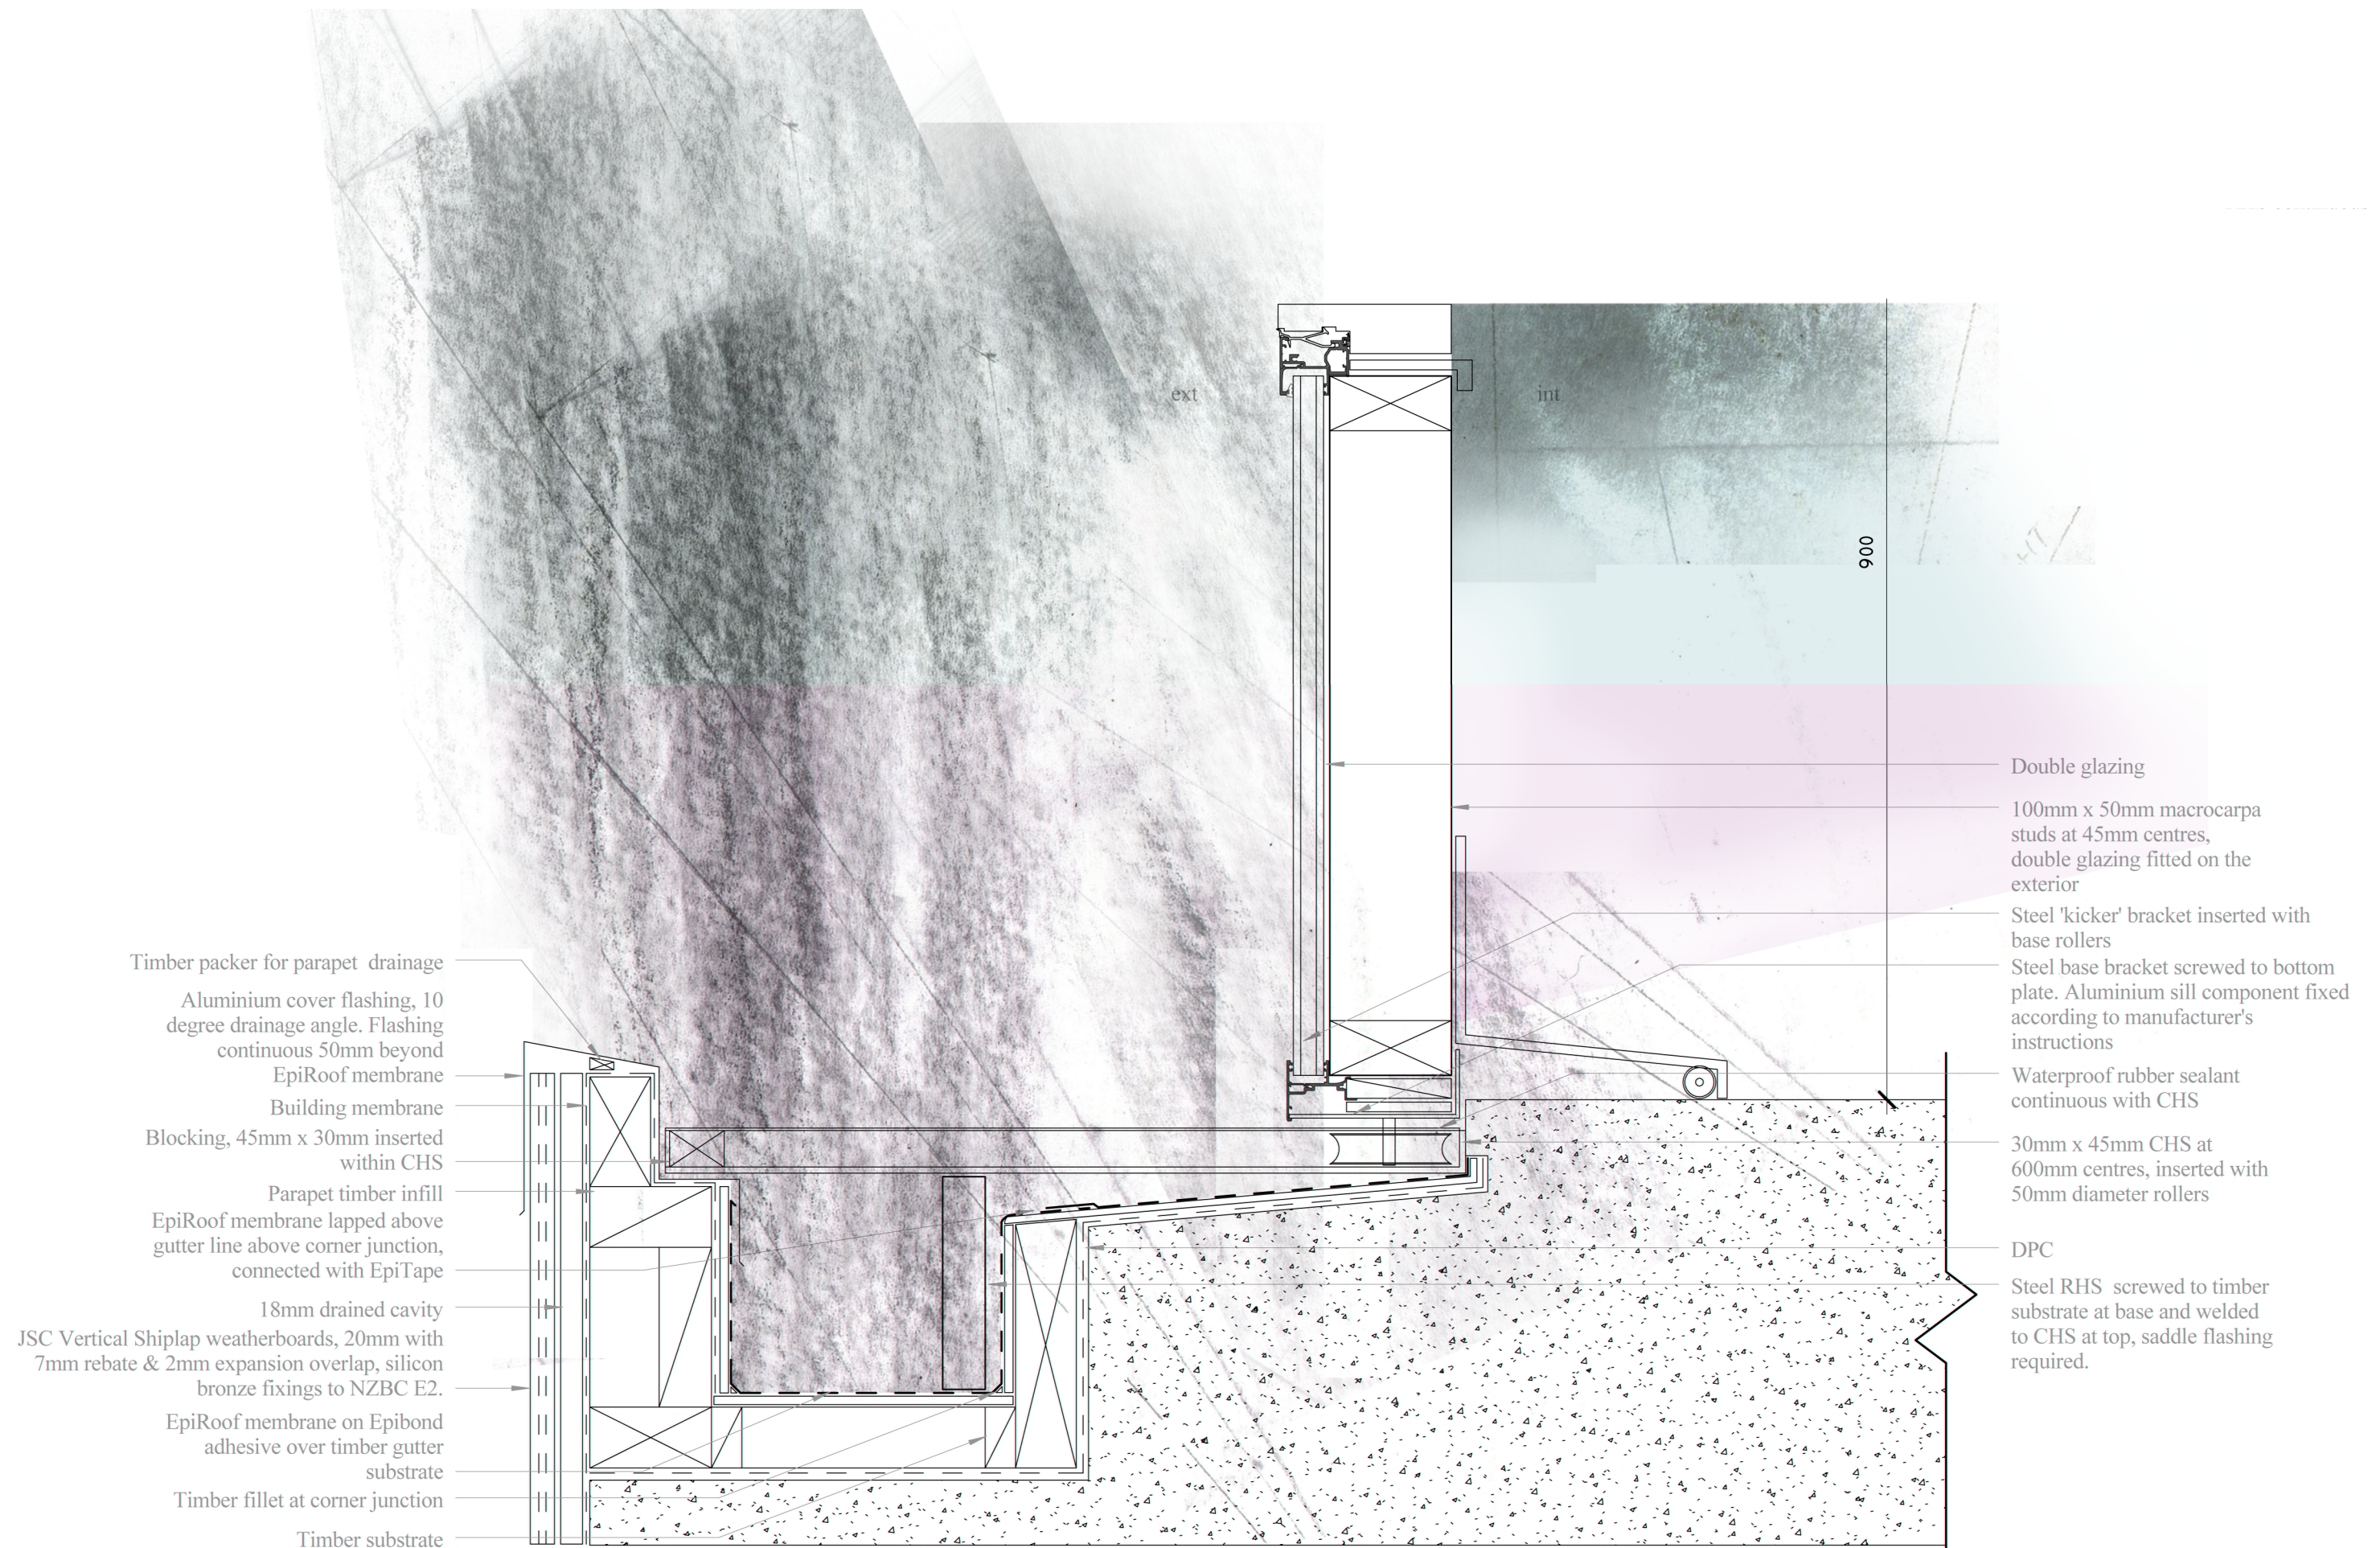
Detail V (1:5). Sliding lower wall & parapet detail at northern boundary of upper eastern studio enabling sunlight to fall at feet/ base of working desk. Created by Author. Hand and digitally composed.
